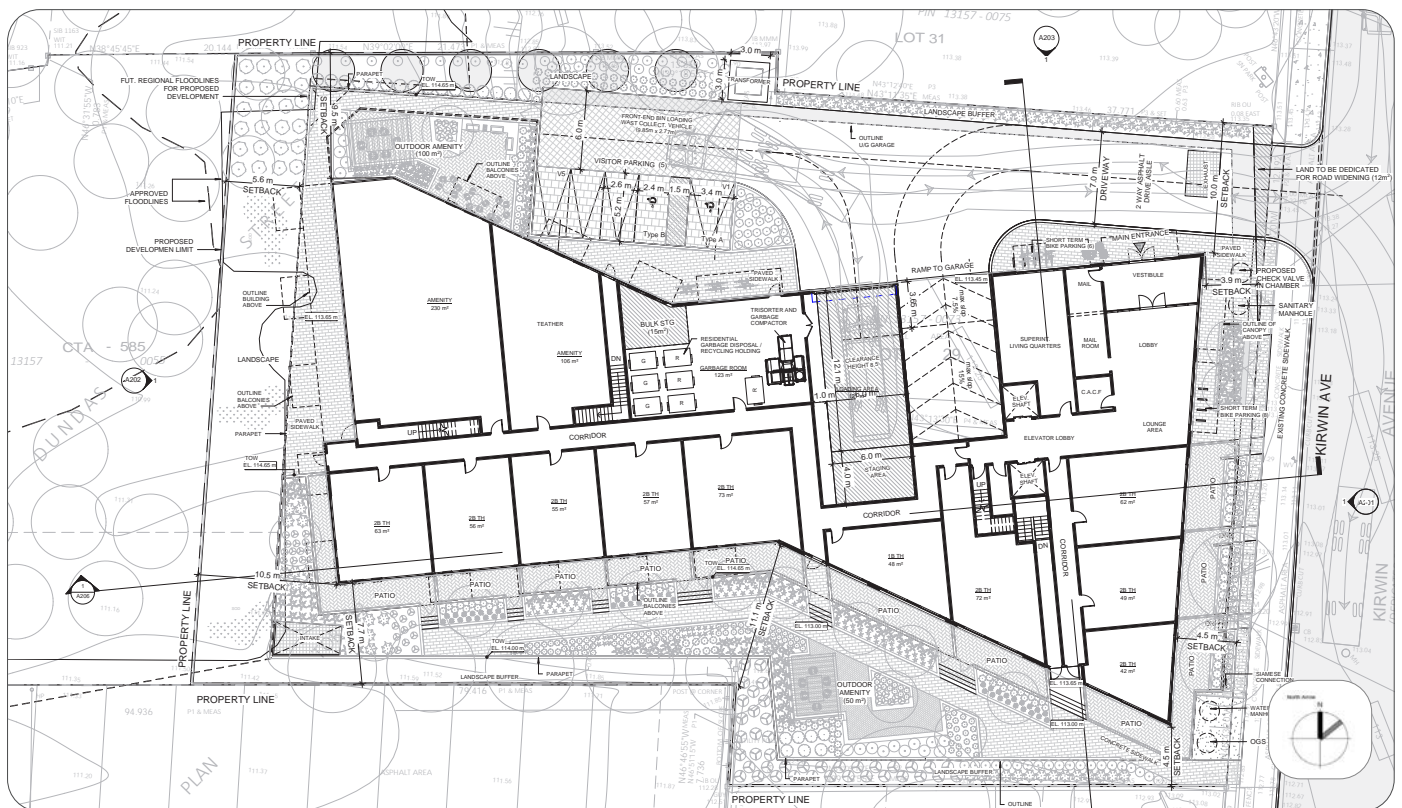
Ground Floor Plan, prepared by KFA Architects + Partners Inc.
